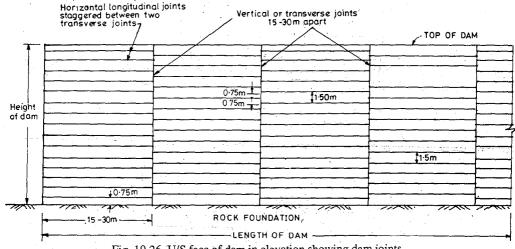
U/S face of dam in elevation showing dam joints.
